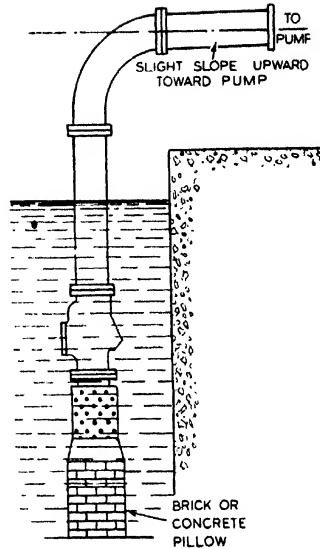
ALTERNATIVE ARRANGEMENT OF SUCTION PIPE
